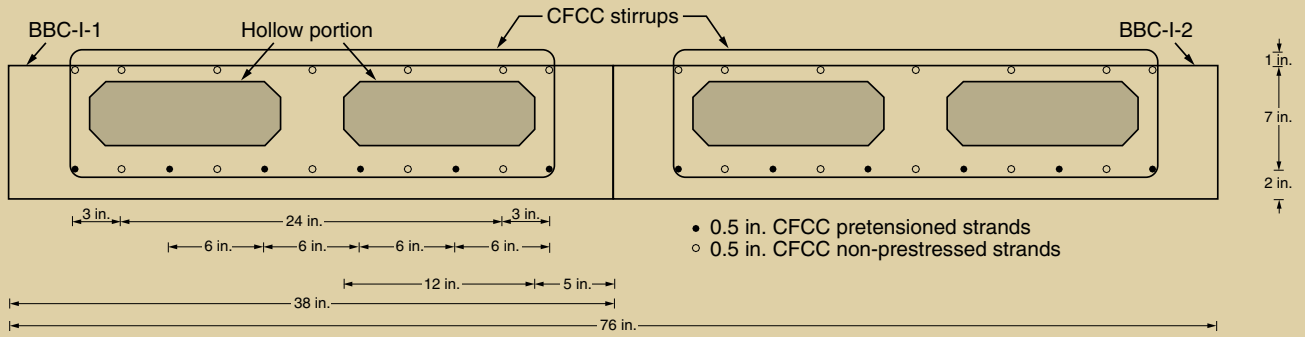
Shown are the designations for the adjacent box beams that comprise specimens BBC-I, BBC-II, and BBC-III.
